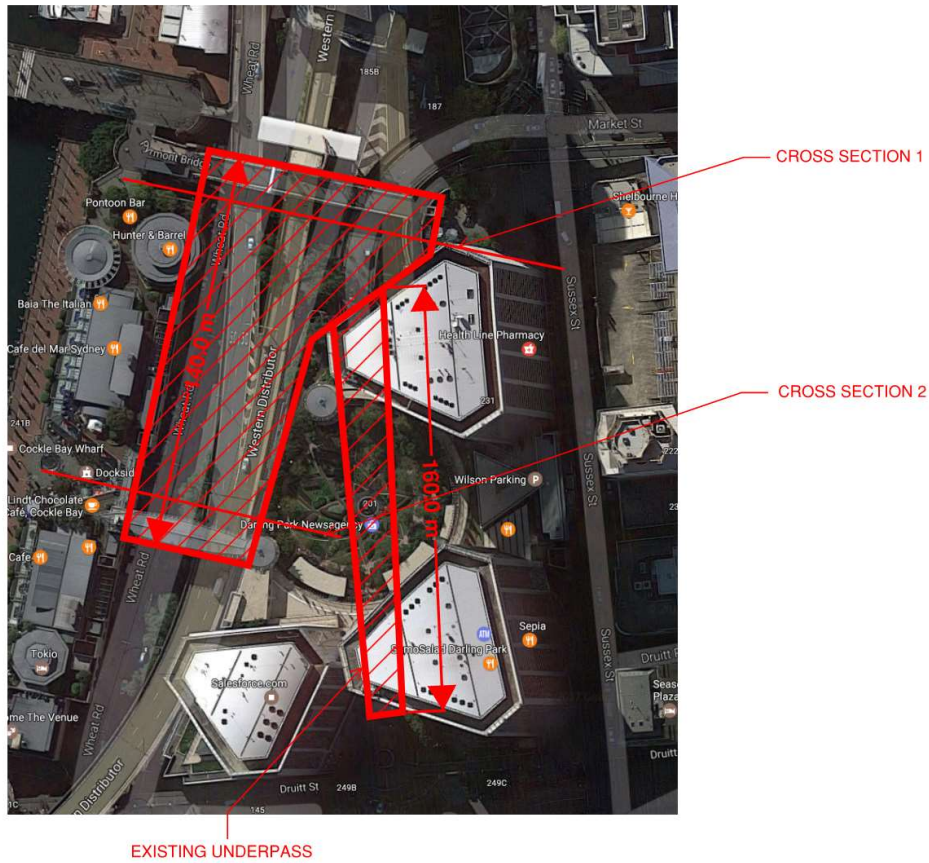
Extent of proposed land bridge and existing underpass – plan.
